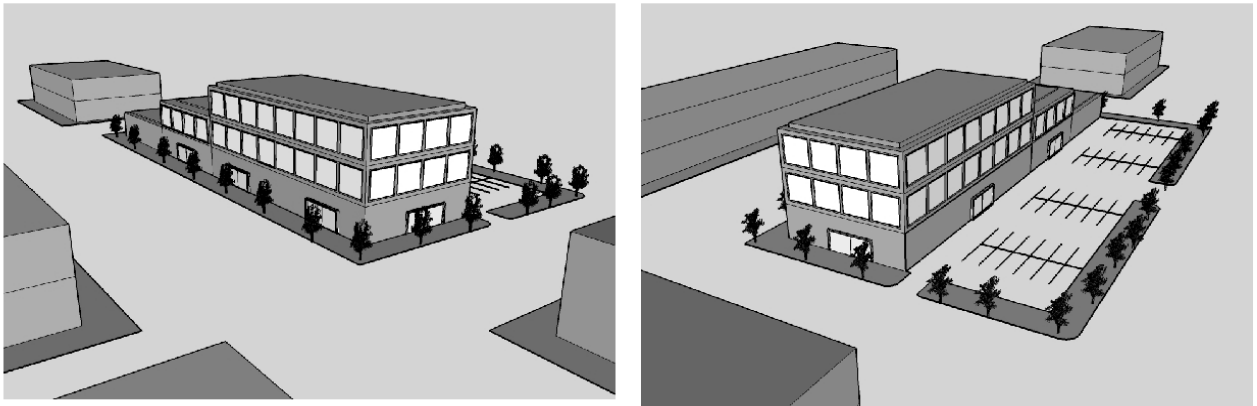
Illustrations of Parking Located at the Rear of a Building
